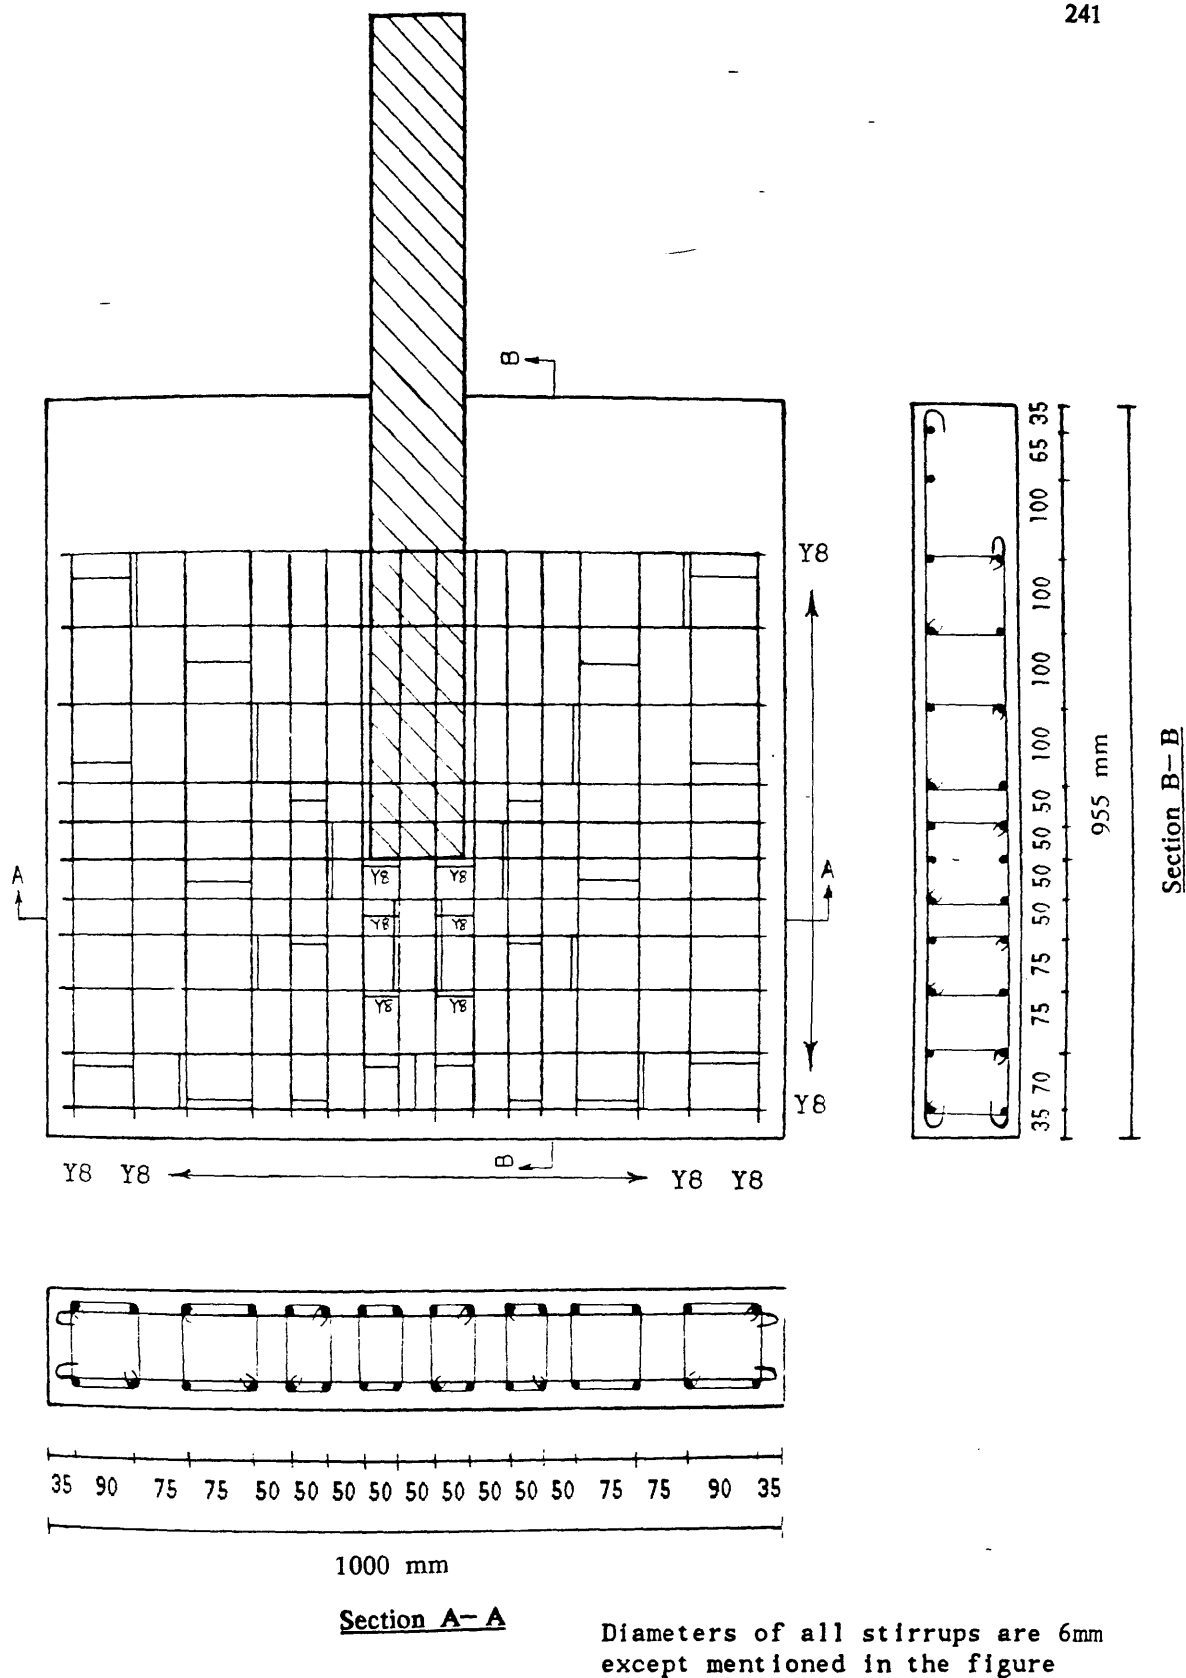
b) : Arrangement of bottom reinforcing bars including closed vertical stirrup in the slab of model MS6
